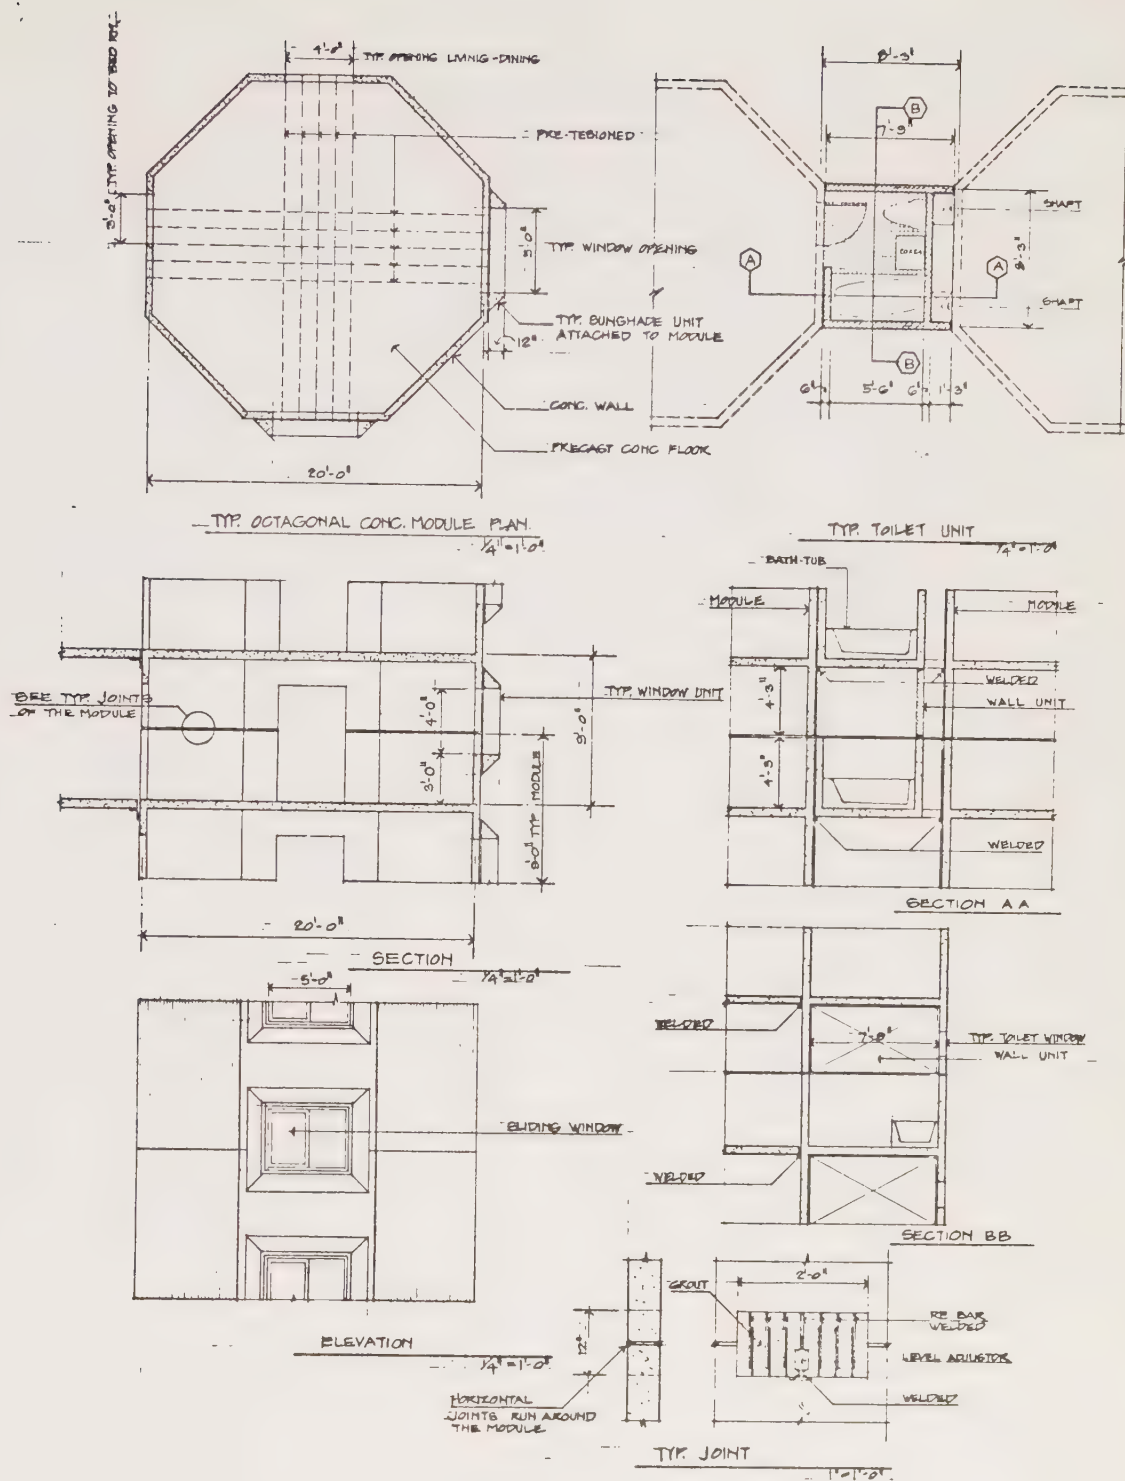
TYPICAL OCTAGONAL MODULE PLANS
